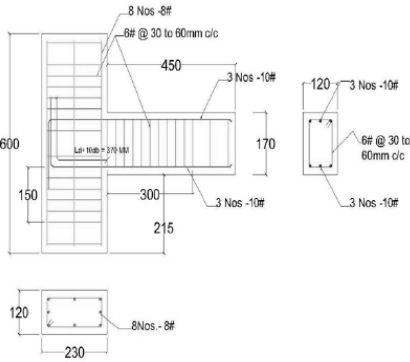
Reinforcement detailing of the conventional Beam Column Joint as per IS 13920: 1993
